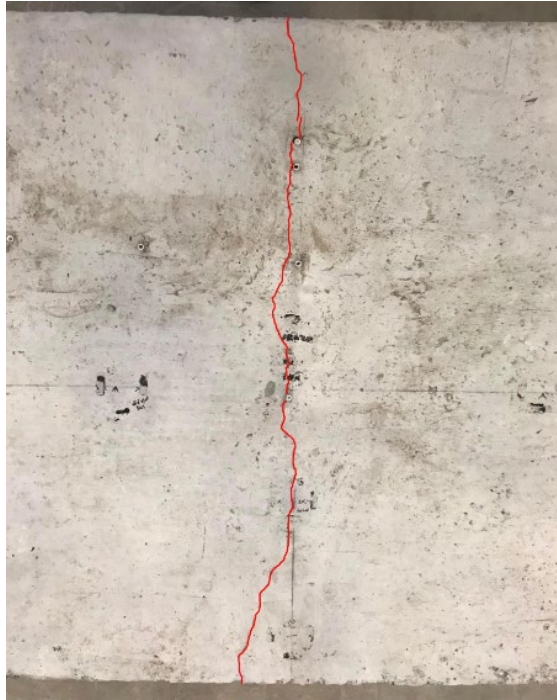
Cracking in concrete of Panel 2, at top concrete surface
